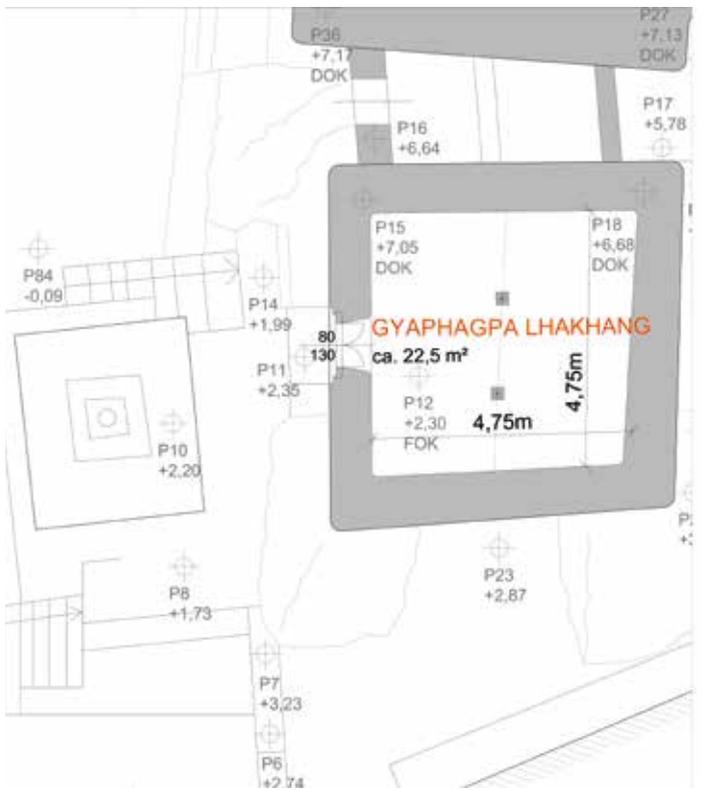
Site plan and plan of Gyaphagpa Lhakhang.
